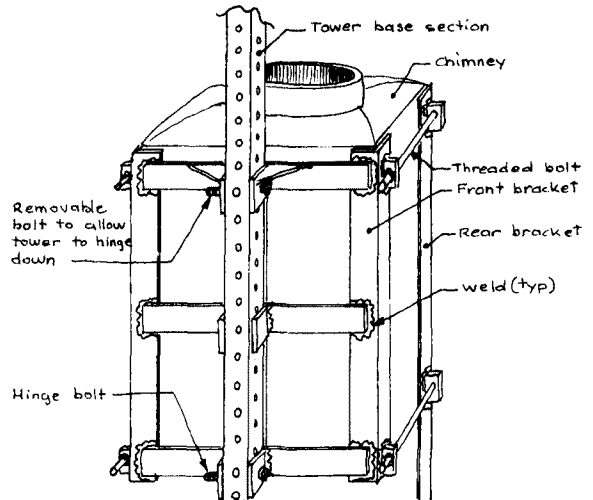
Hinge assembly, consisting of a front and rear bracket, is fastened with two 2-foot long threaded bolts.
